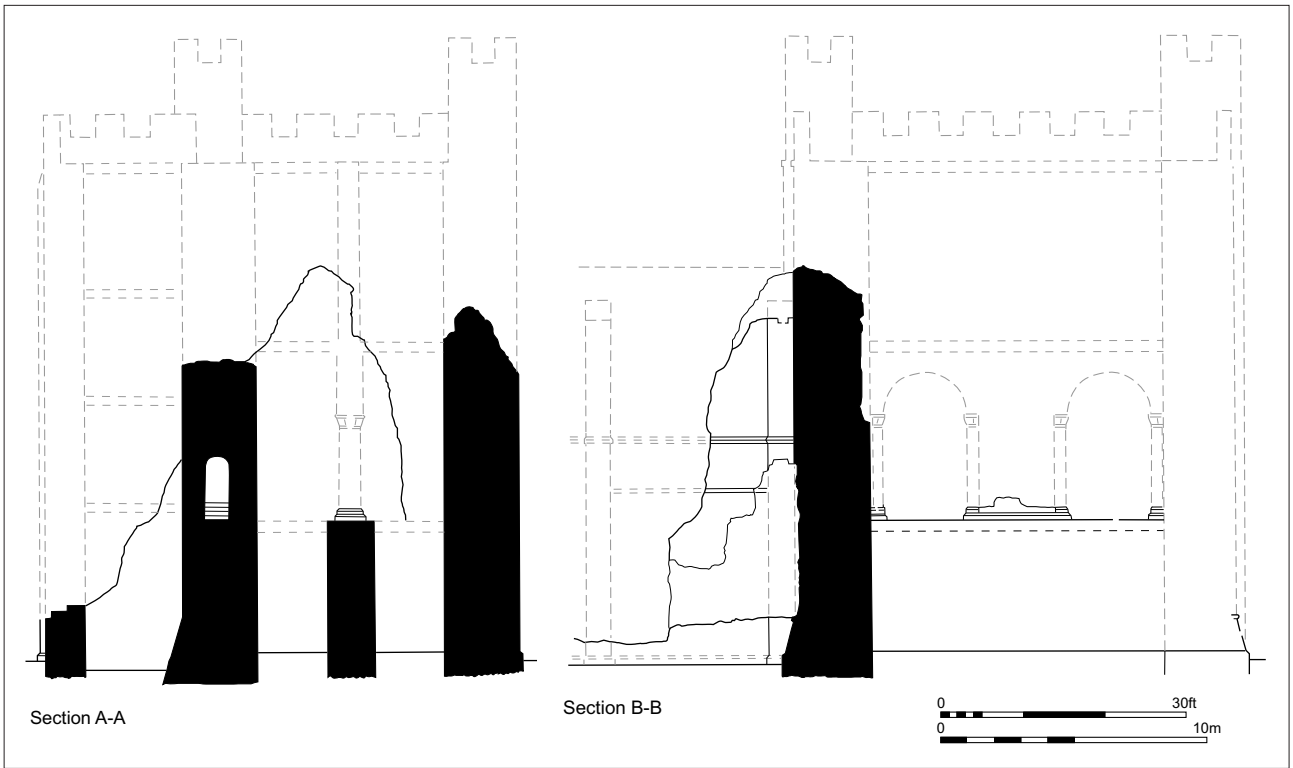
The central building complex: diagrammatic reconstructions of north-south and east-west sections through the great tower in Phase I
